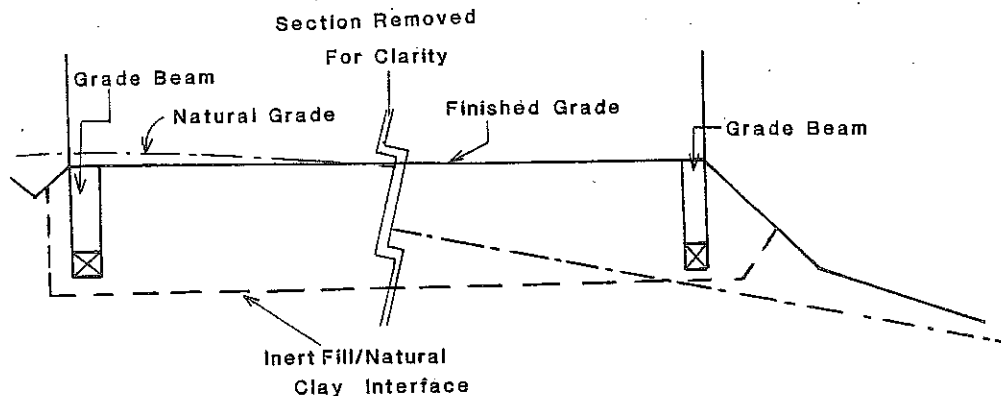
Subsurface drainage modified by design. Design consisted of removal of clay soils and replacment with inert clayey sand fill.
